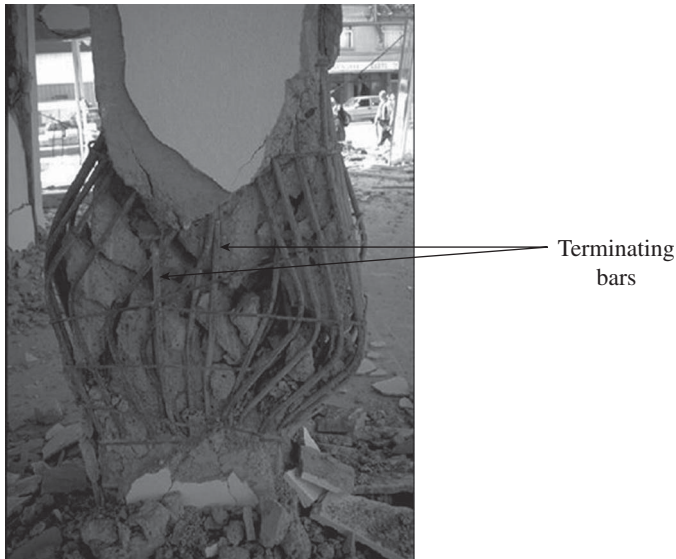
Shear failure leading to a storey mechanism and subsequent collapse of building
